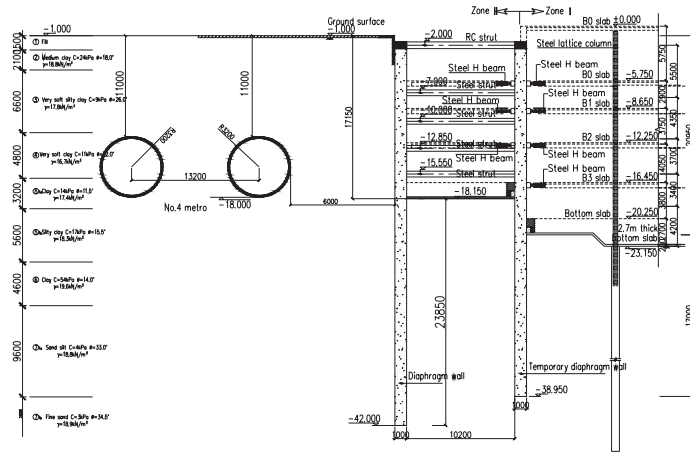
Sectional view of the retaining system of the Shanghai Shengda Center.
